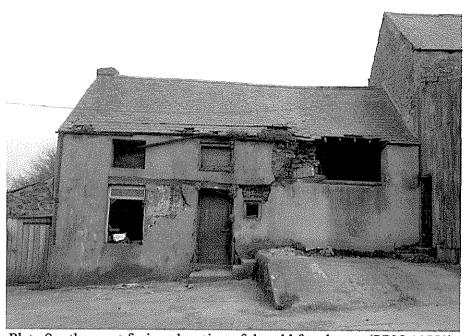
the west facing elevation of the old farmhouse (PRN 44558).
